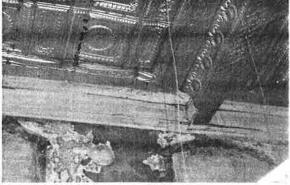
When the dividing walls were constructed, the western cornice was relocated to the courtroom side of the new wall.
